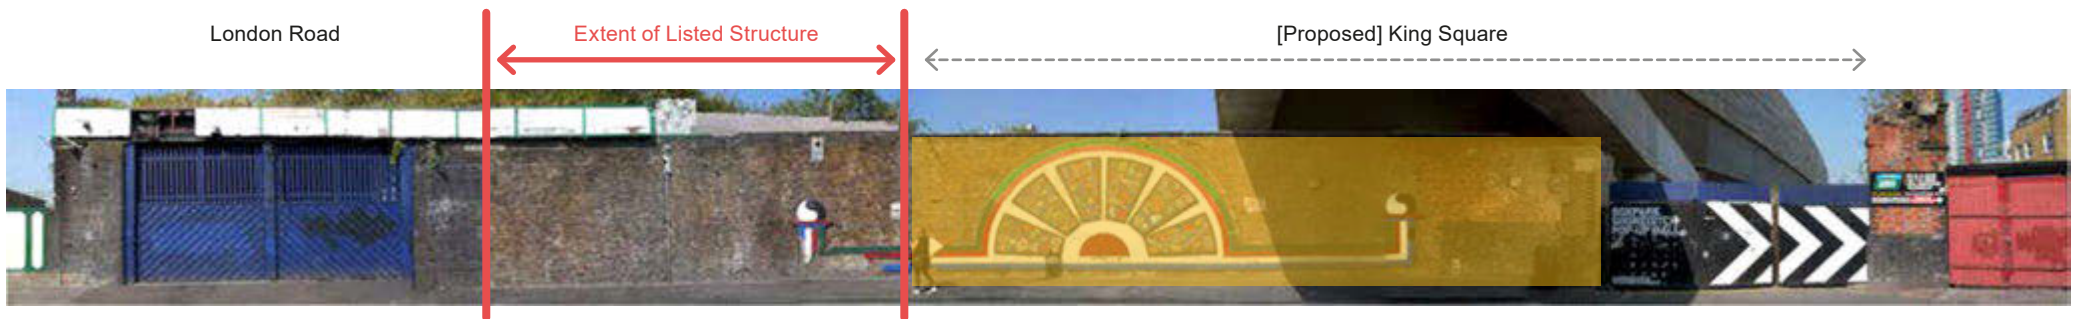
Existing Brick Lane street elevation, highlighting extent of Listed structure to be retained and the wall to be demolished (yellow)
